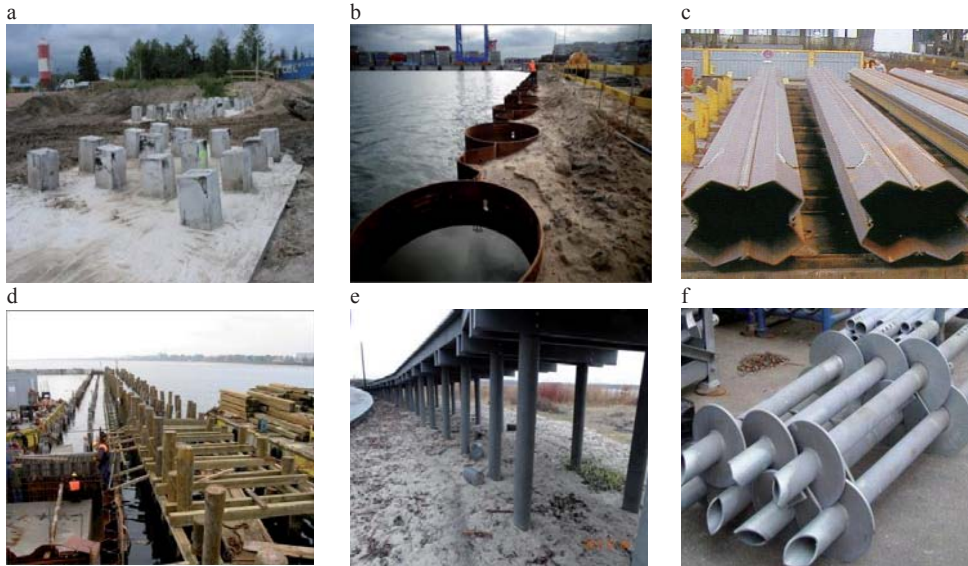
Types of piles: a – prefabricated reinforced concrete piles (photo by K. Gwizdała); b – pipe piles (photo by K. Gwizdała); c – steel profile piles (©Thyssen Krupp); d – wooden piles (photo by K. Gwizdała); e – plastic piles (©Akerpol.pl); f – disc screw pile (©sw.birmiss.com)
